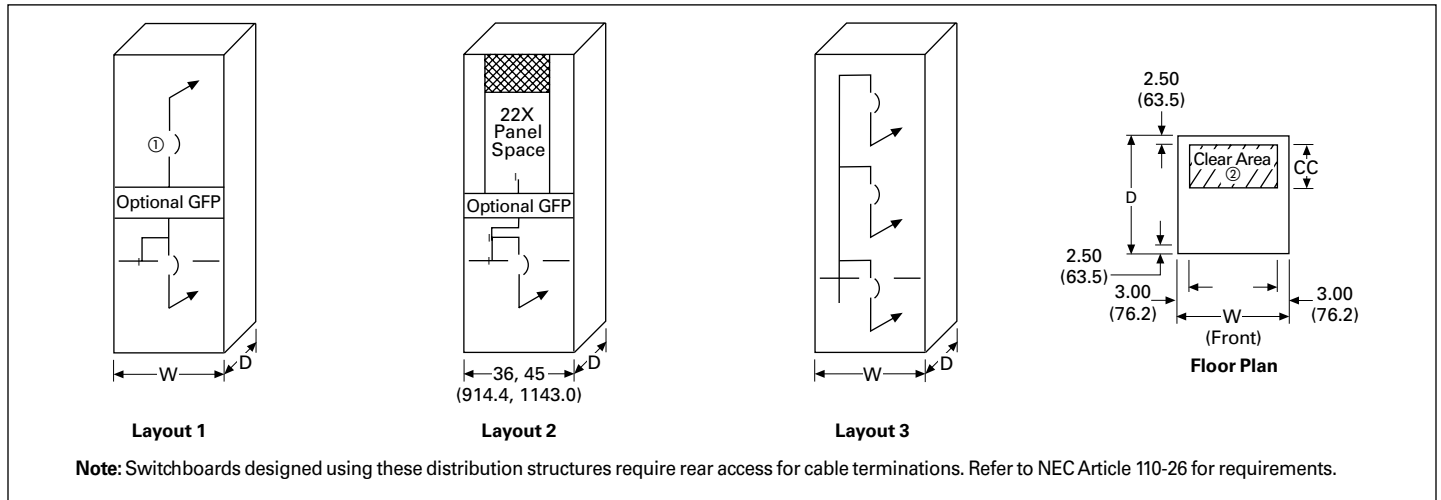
Individually Mounted Feeder Layouts—Dimensions in Inches (mm)
